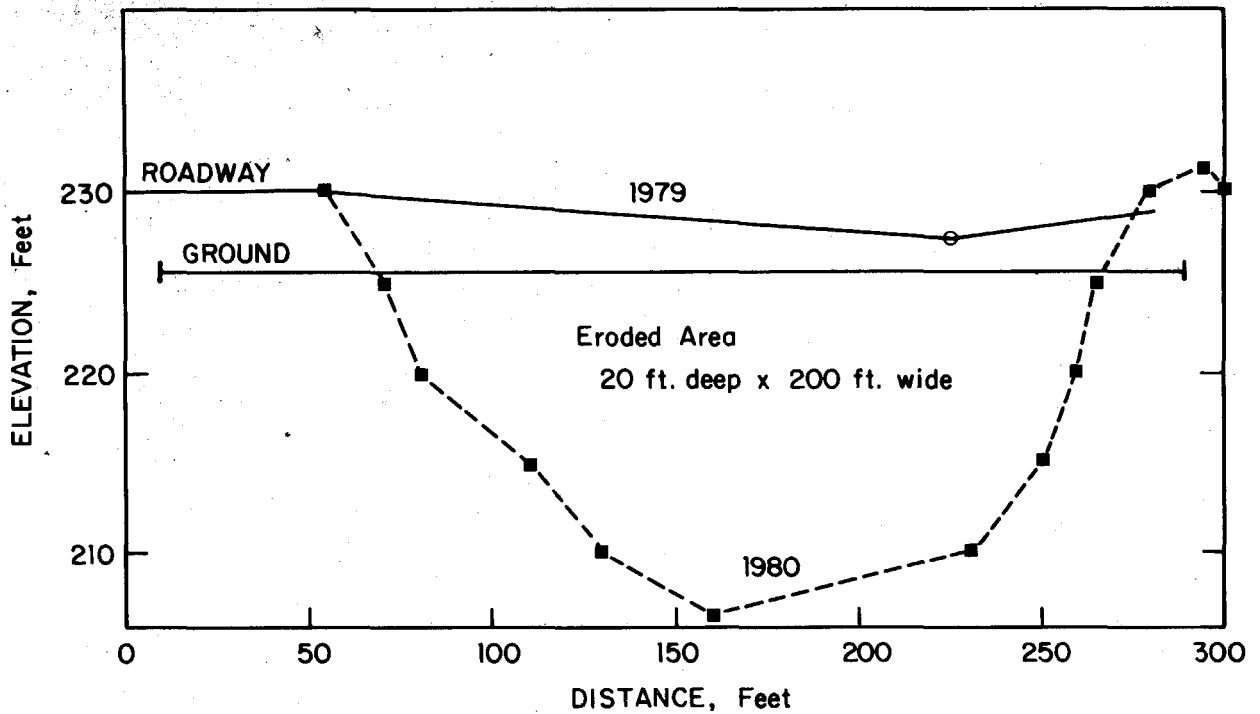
A Cross section at the damaged location at Camino del Rey of Moosa Canyon Creek.
